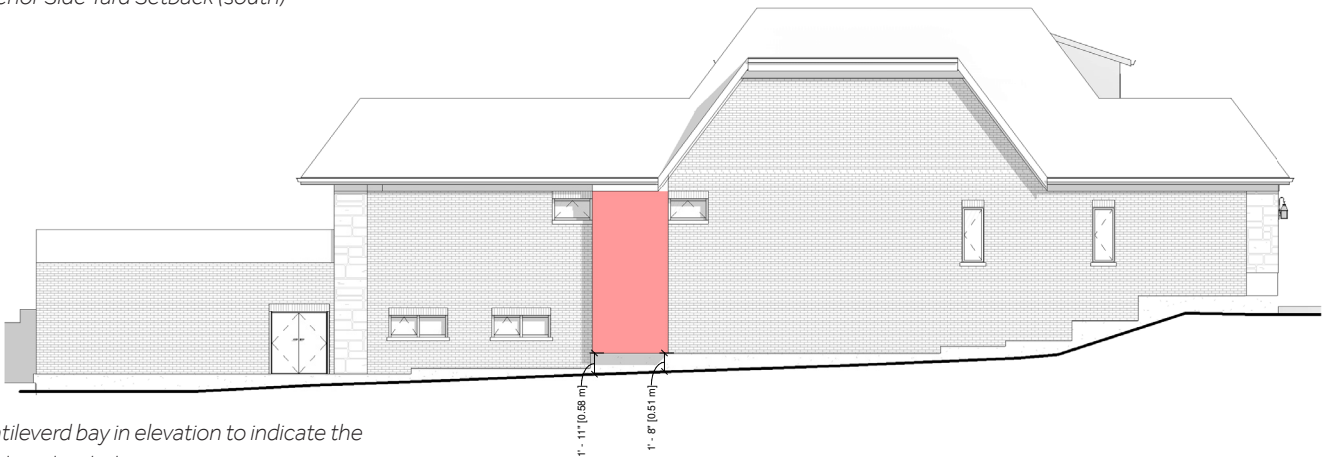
Cantilevered bay in elevation to indicate the uninterrupted grading below
